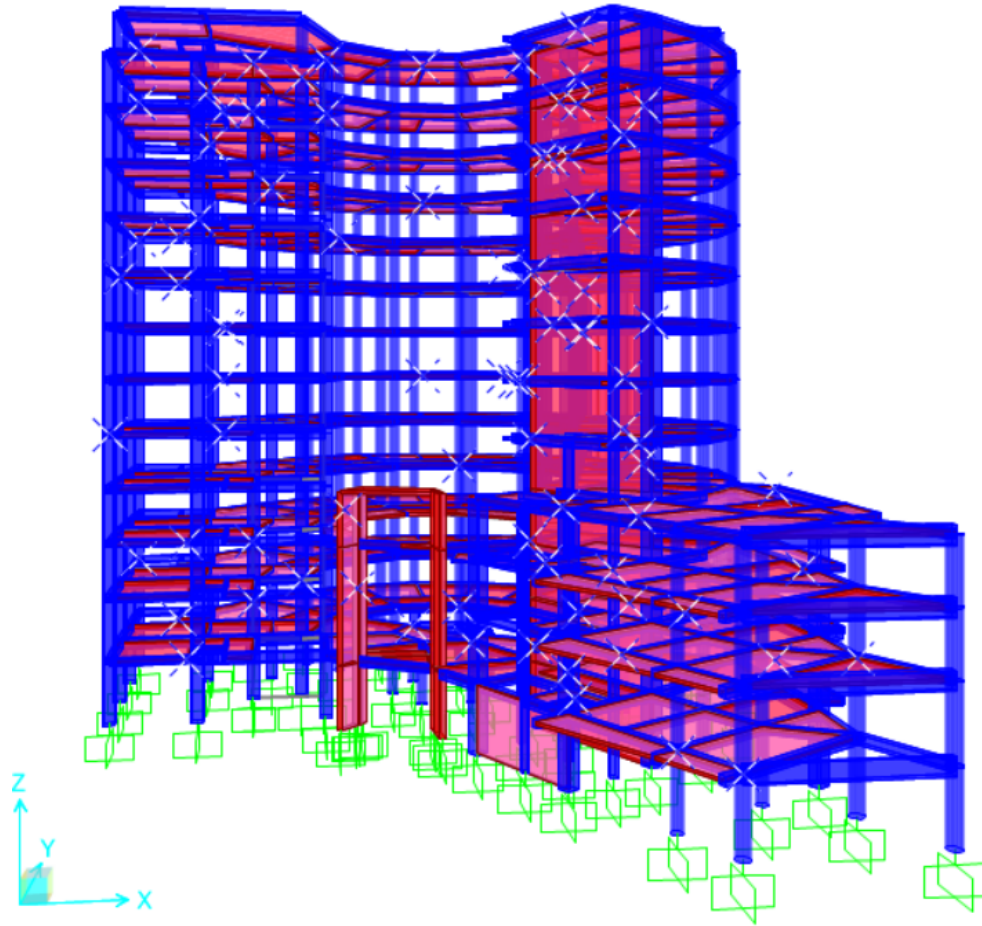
Final sensor layout for Tower HQ in 3D Model
